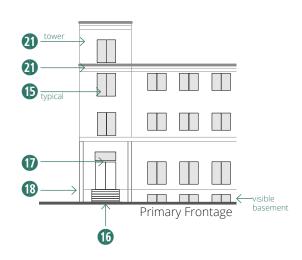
H-3. Civic Building: Facade Design Requirements
